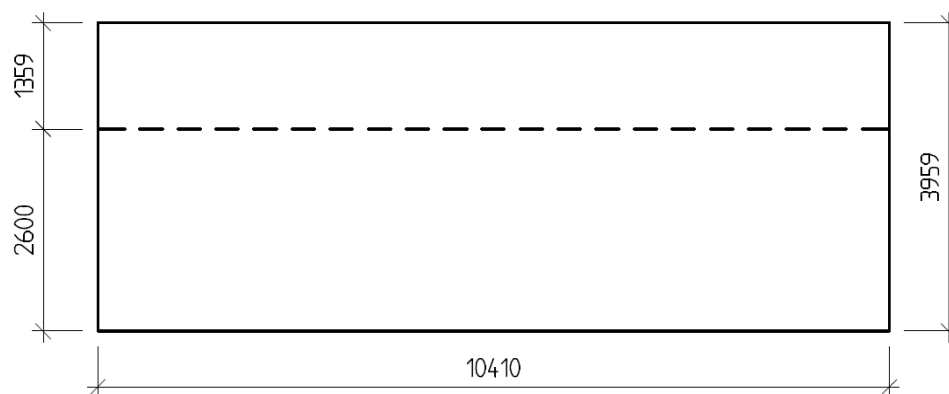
Section of the integrated breast wall [mm]. Cross-section A-A according to Figure 5.2.
